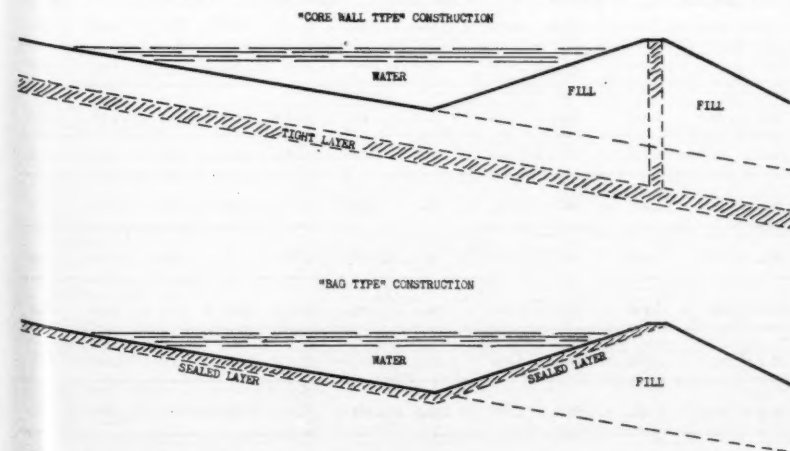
Two concepts in farm pond construction: core-wall type demanding subsurface tight layer, and "bag" type wherein a sealed layer over the pond floor and up the face of the dam is created
